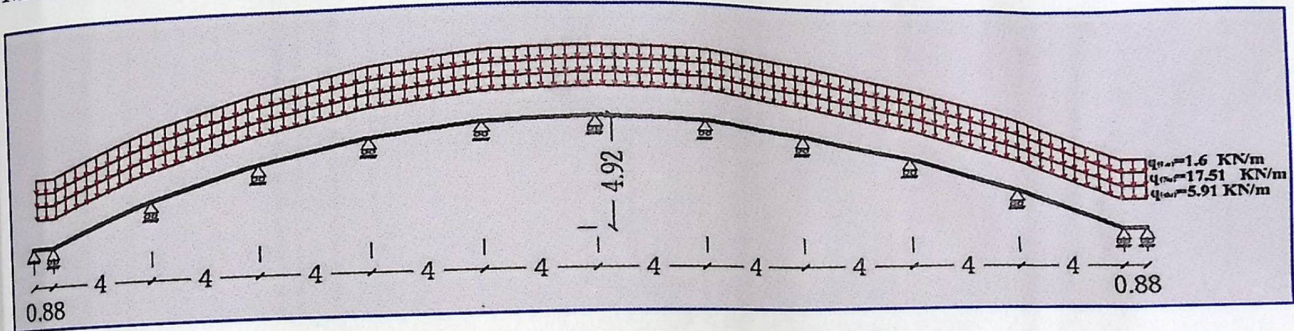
System of one way solid slab of hall's roof with loading.
